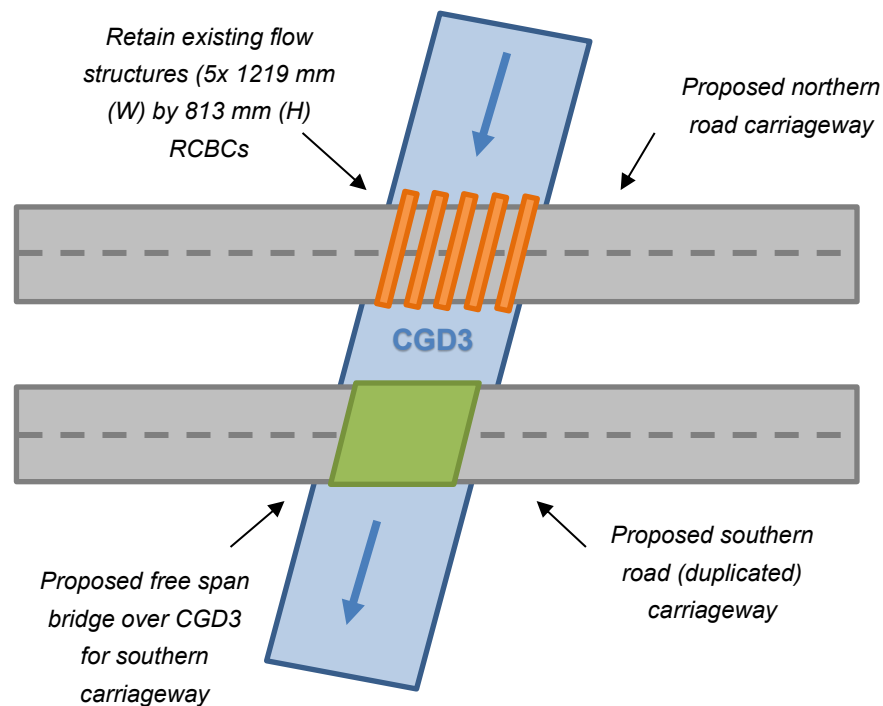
Plan view of proposed structure arrangement at CGD3
